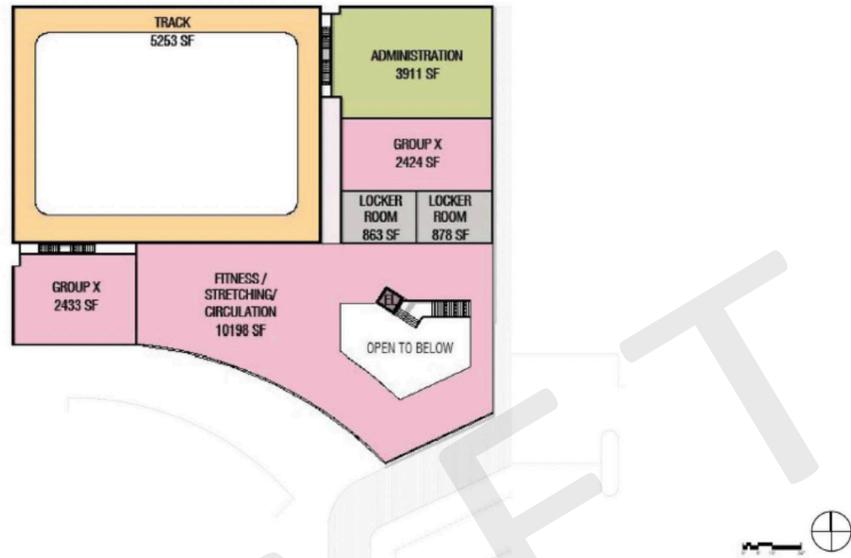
shows the potential second floor plan for the renovation resulting in a 75,000 sq. ft. facility.
